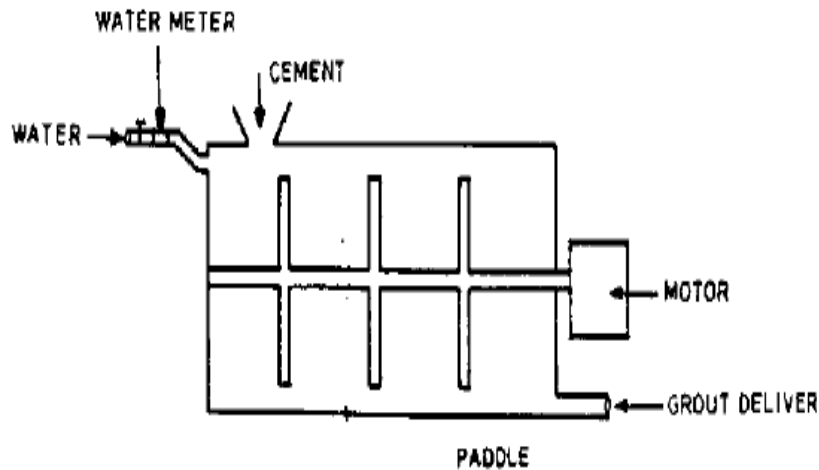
Typical layout of a grouting plant (Adopted from Houlsby, 1983).
